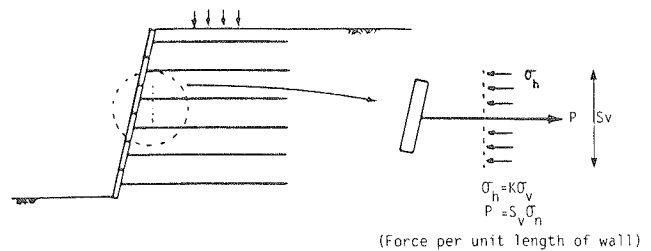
Concept of local stress equilibrium in reinforced soil slopes.
